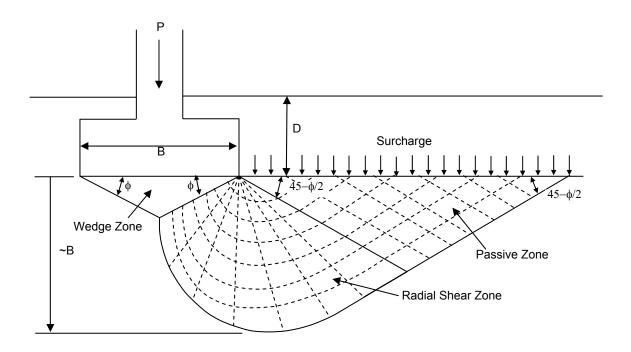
Assumed failure surface used to estimate the bearing capacity of a square footing. The depth of the failure surface is approximately equal to the width of the footing (after Das 1984).
